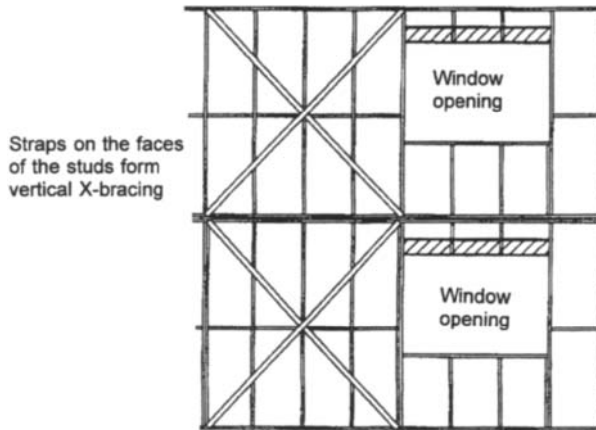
Elevation of a building with vertical 'X' bracing, Grubb and Lawson (1997)
